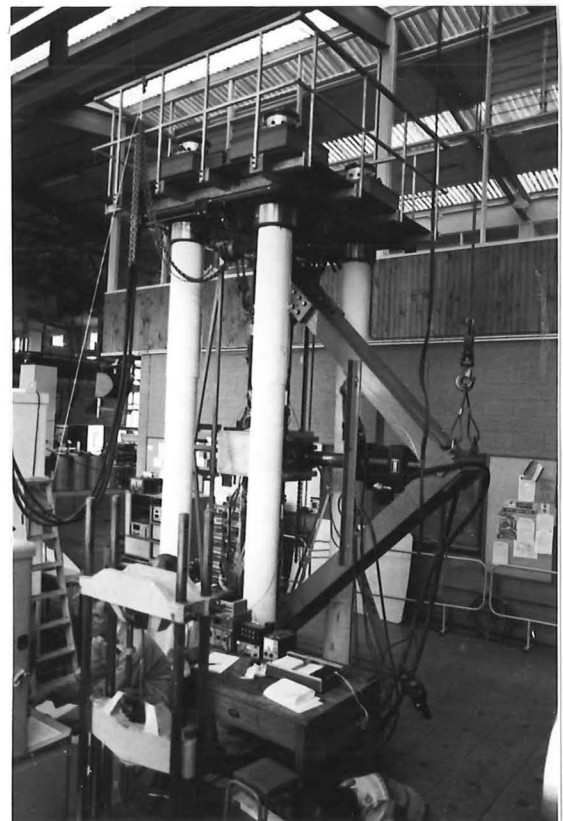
OBLIQUE VIEW OF TEST SET-UP
